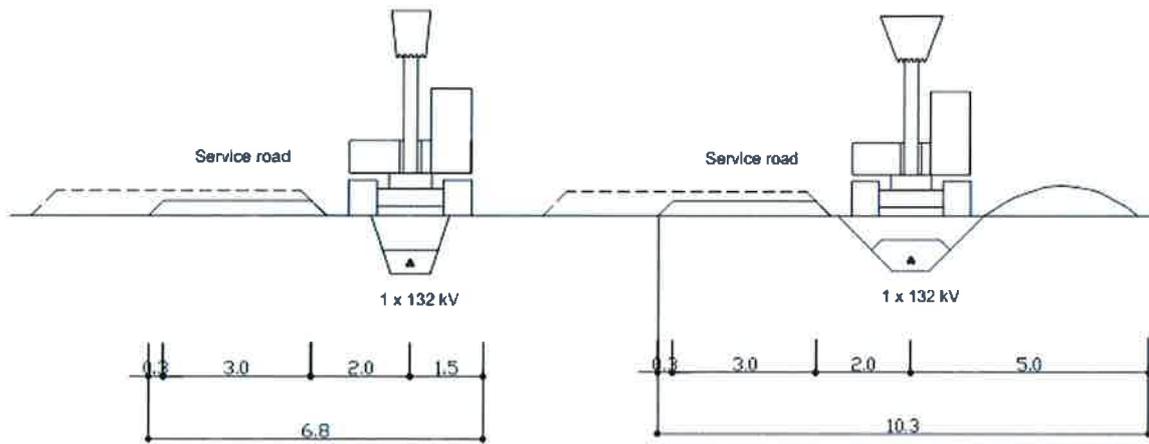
132 kV cable, minimum cross-section with service road. On the left excavated soil is removed from site. On the right excavated material is placed beside the trench.
